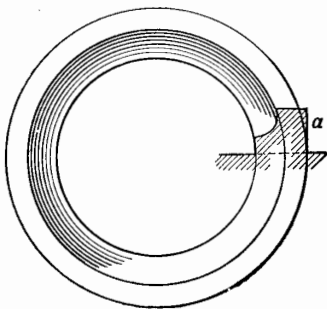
Front View of a Circular Panel with Section of Cove Mold
